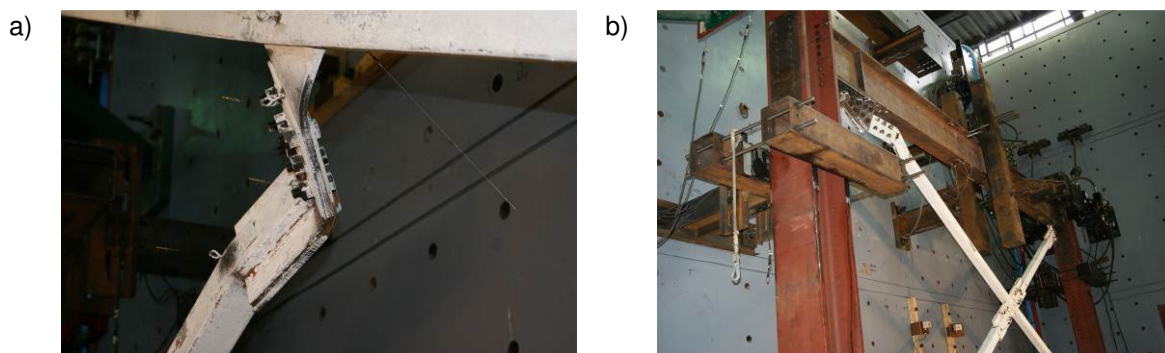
Connection buckling in Specimen no. 12 with DS connections and tack welded shim plates:
